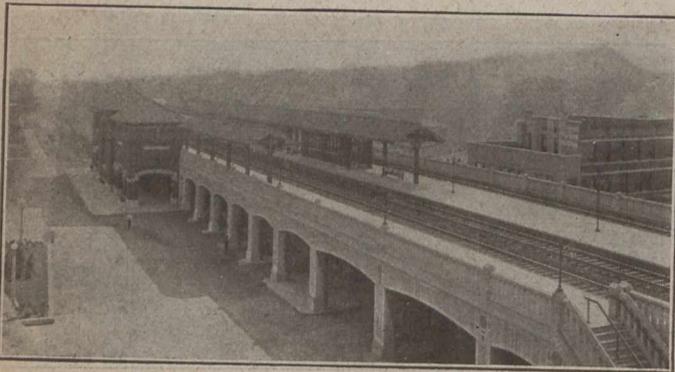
Flat-Slab Bridge Carrying Lackawanna at South Orange Station
